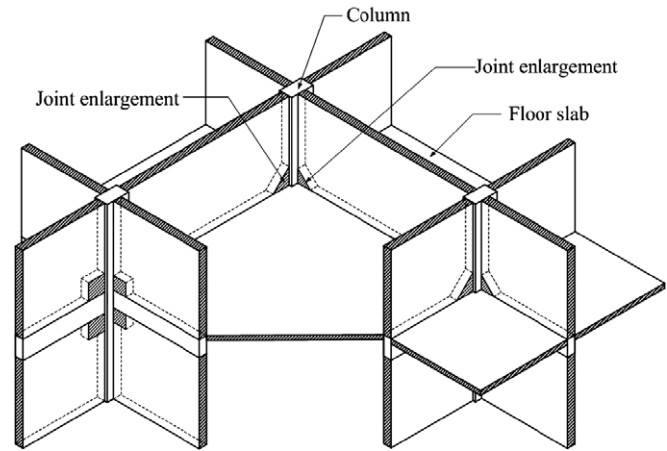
Beam–column joint strengthened by planar joint enlargement.
